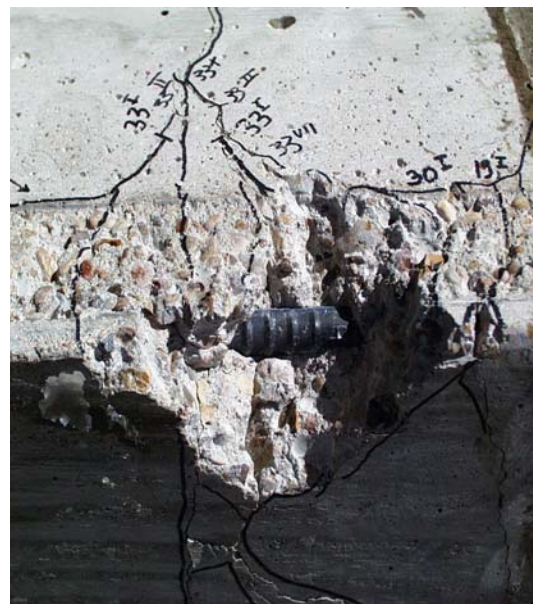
d: Spreading of cracking forming a delta pattern at midspan and concrete cover pulled off by the laminate
